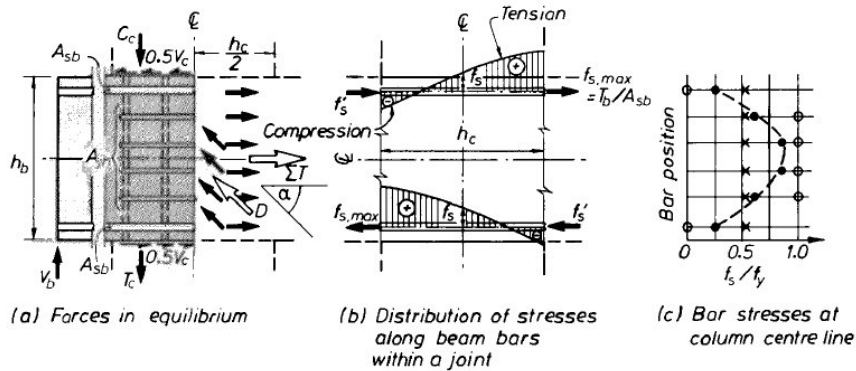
Actions on beam within a joint containing horizontal joint shear reinforcement (Paulay [12])
